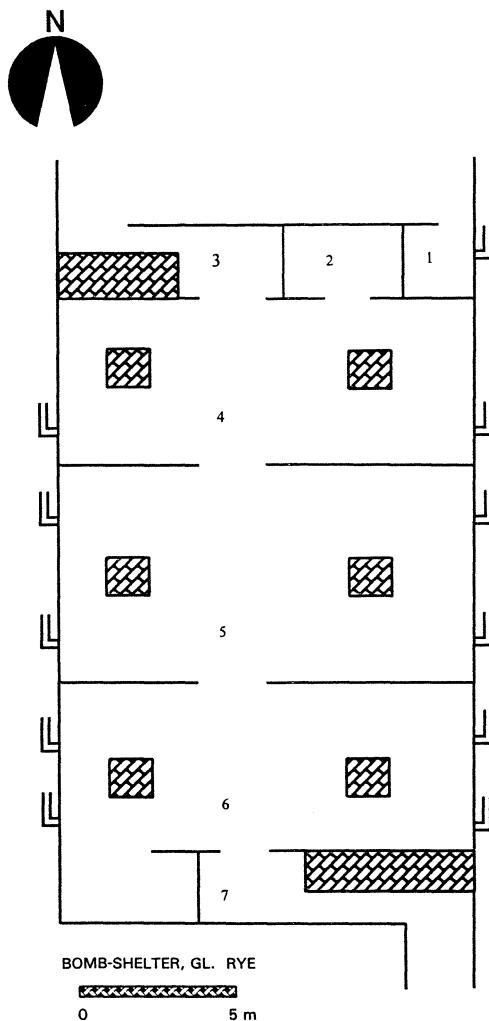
Floor plan of the bomb-shelter at Gl. Rye. In the text rooms 4, 5 and 6 are referred to as "inner bomb-shelter"; the eleven air shafts are shown. Redrawn after plan by Birger Jensen.
